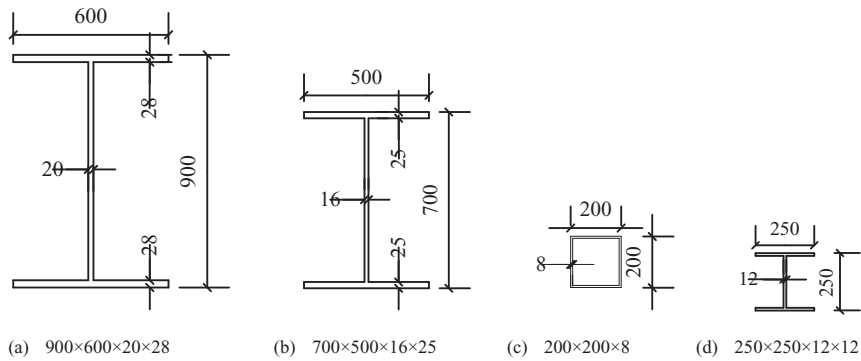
Shapes and dimensions of cross sections of beams, columns and braces of the valve hall (unit: mm).
